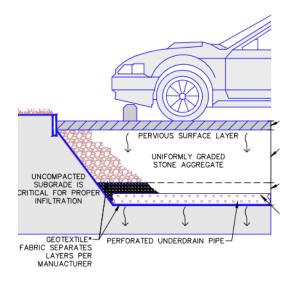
Detail for a typical pervious pavement installation. See the Greenville County Design Manual Appendix G for more specifications.
